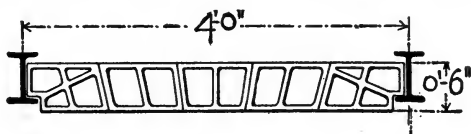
Terra-cotta Arch used in Montauk Building, Chicago (1881).
